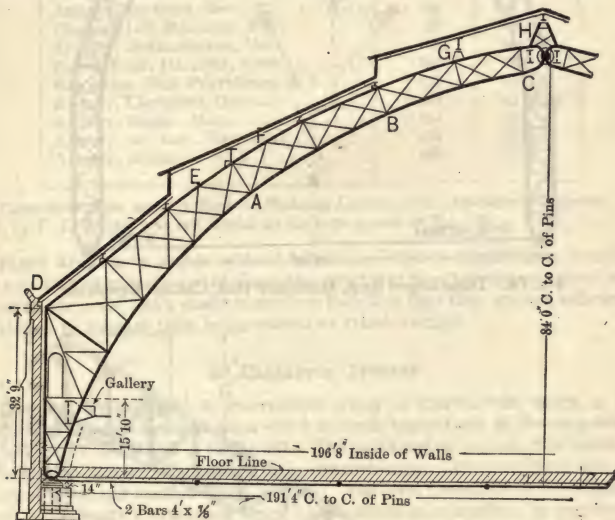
Half Truss, Three-hinged Arch, Drill-hall, Brooklyn, N. Y.
